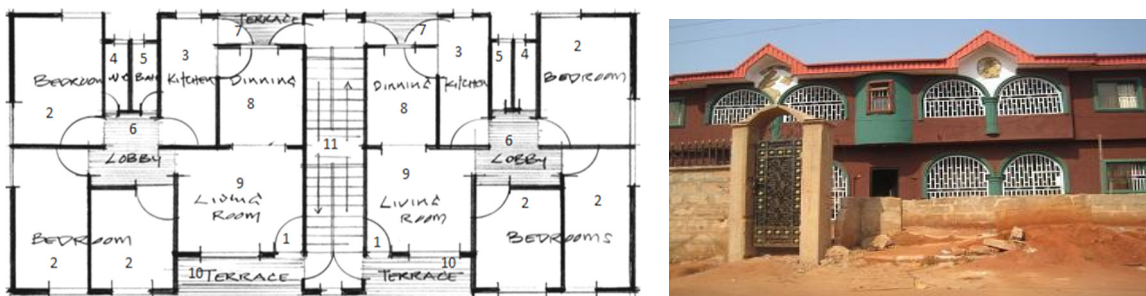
Plan and façade of a Semi-Detached 2-storey House (Source: Ekhaese 2011)
